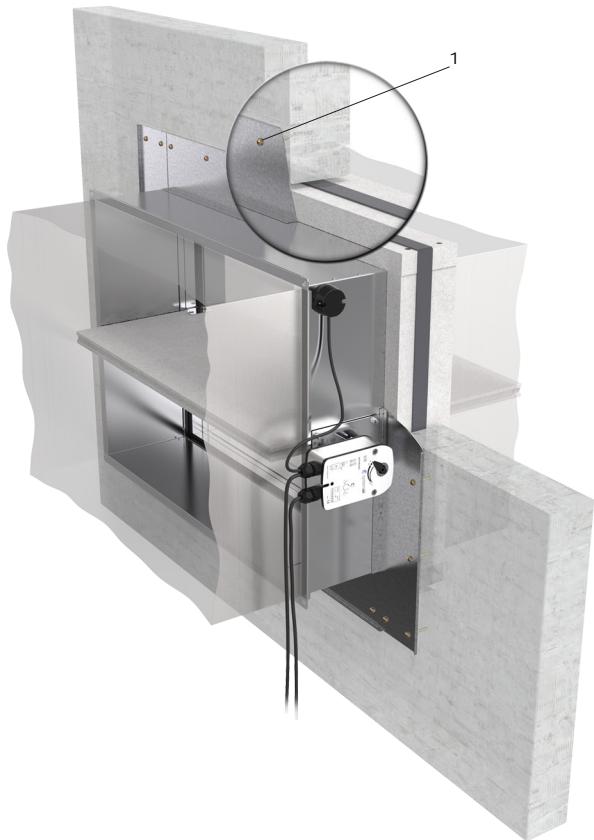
Installation of a square fire damper PKIS using an installation kit
